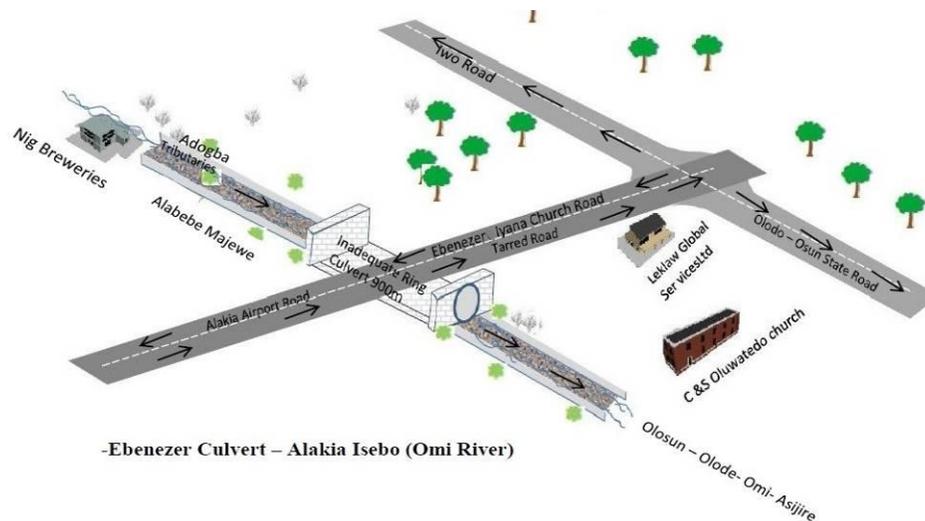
Ebenezer Culvert - Alakia-Isebo (Omi River) Schematic Layout
